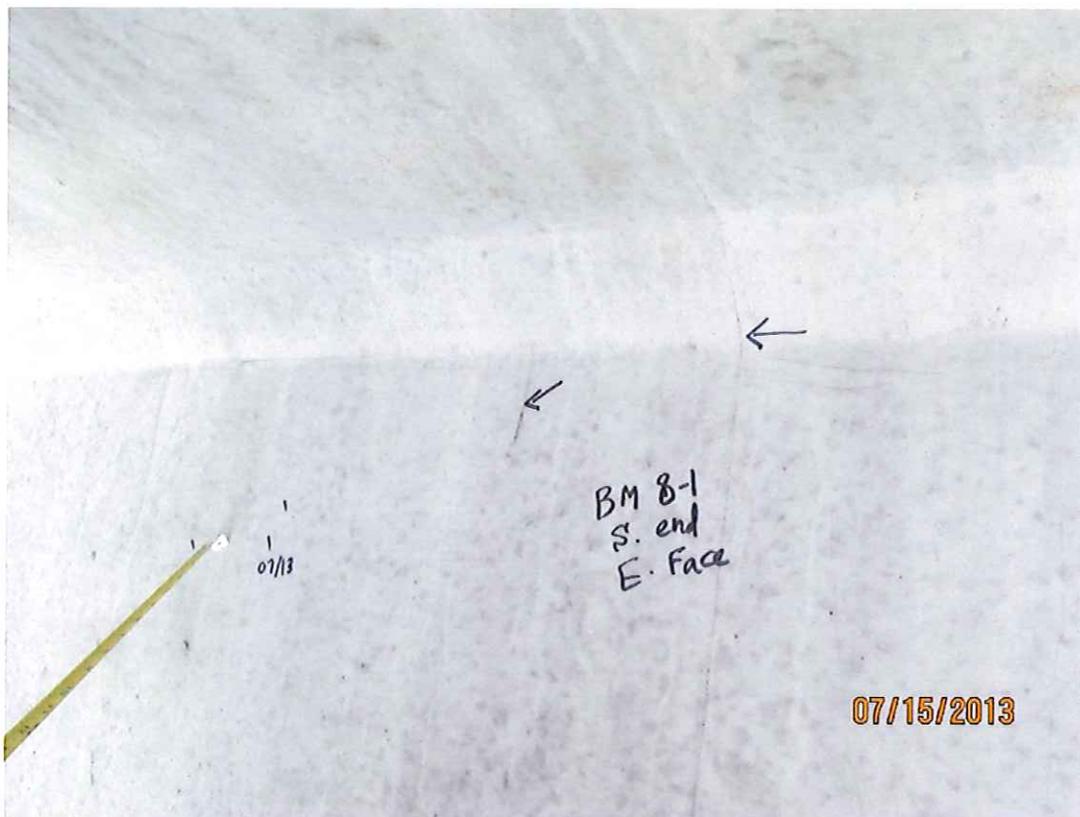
Diagonal crack/ longitudinal crack in Beam 8-1 east face 62in. from south end
